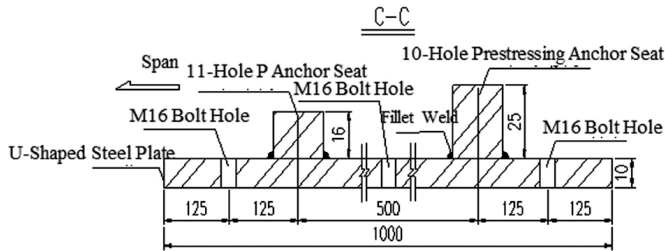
Side elevation view of anchor 1 on the bottom of the beam (unite: cm)
